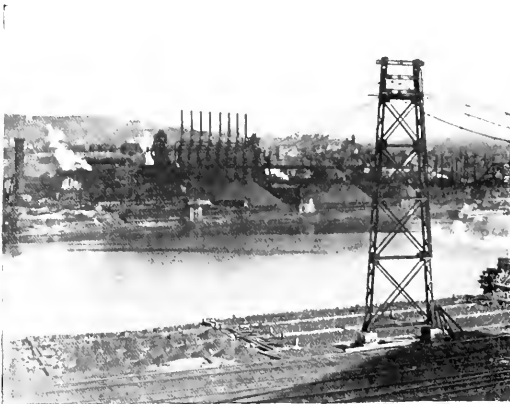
VIEW OF ONE TOWER AND THE LINE.
